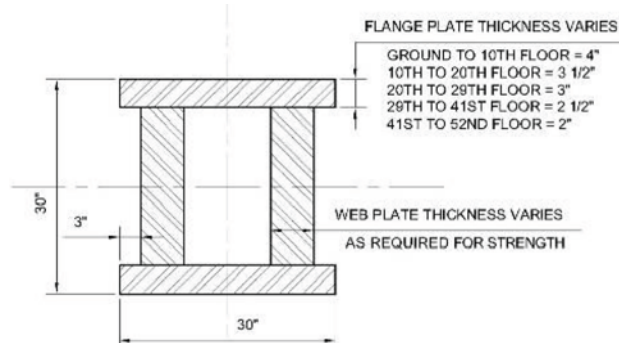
Box Column hierarchy, courtesy of Thornton Tomasetti
